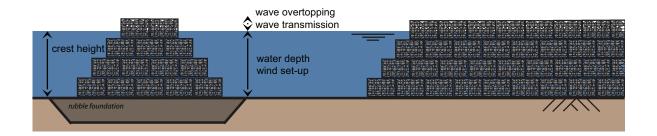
Cross-sectional View (left) and Side View (right) of Gabion Breakwater
